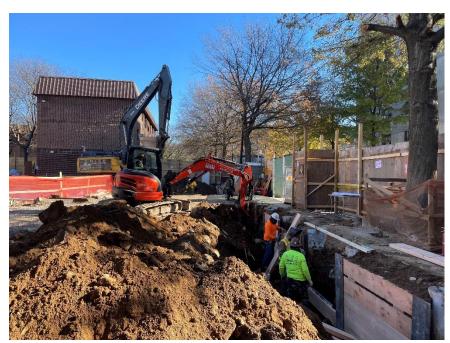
View of Rise installing lagging along the southern site boundary (facing east).
